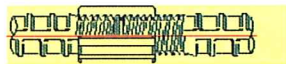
Cold Roll Formed Parallel Threaded Splices
